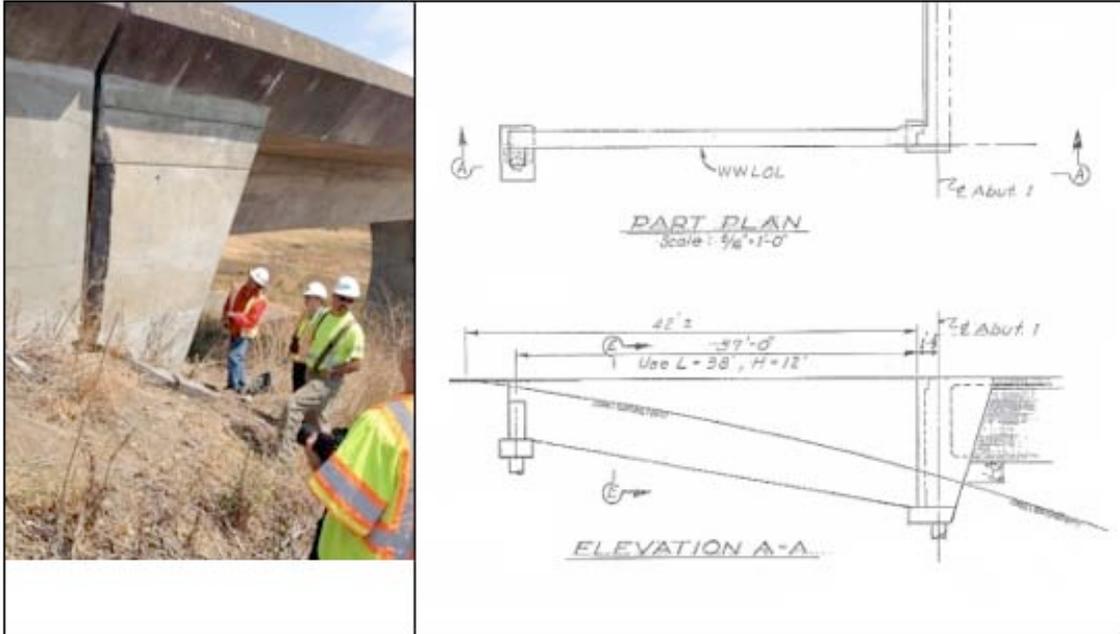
Abutment 14 concrete spall on the Napa River Bridge and Overhead
